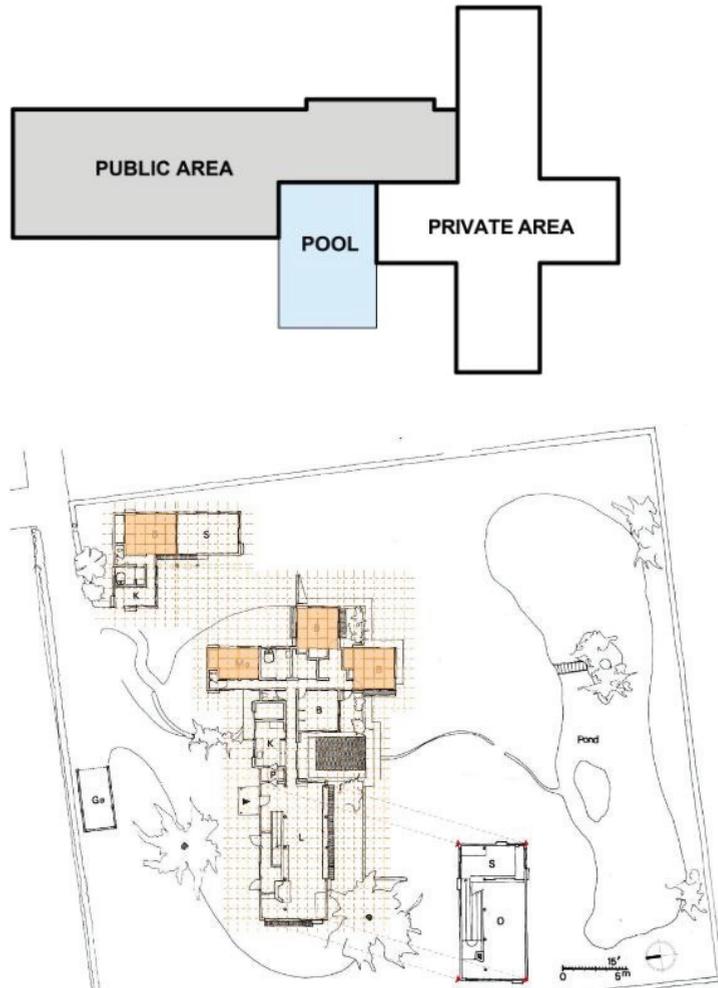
Karuizawa house—public and private area and the pool, plan and views.
